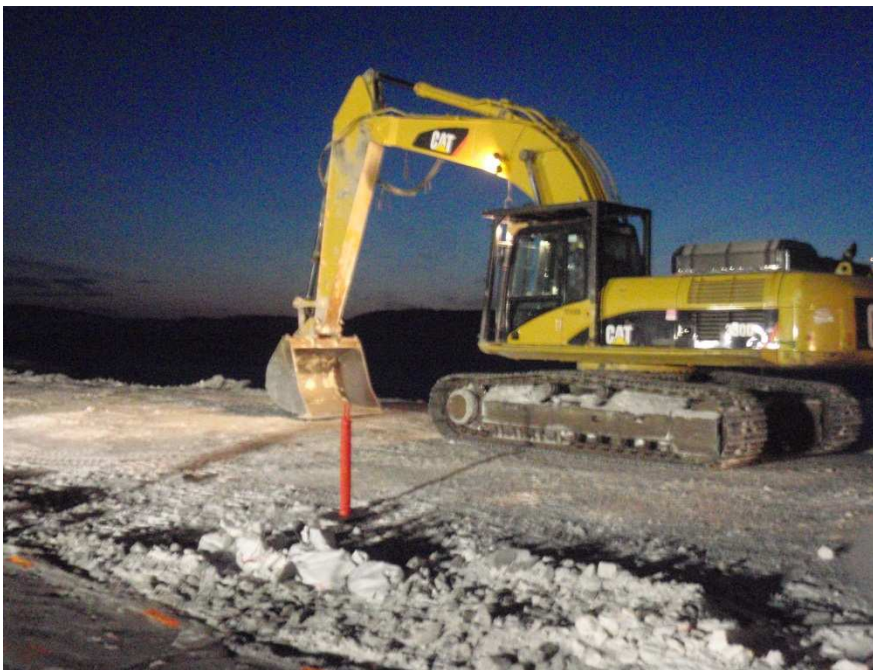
Excavator working on spreading and smoothing ROQ on the upstream
